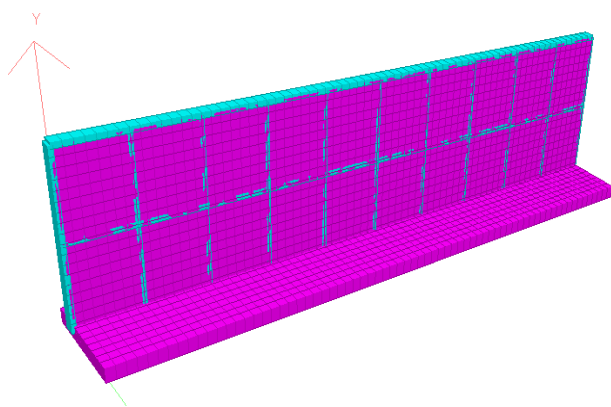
Column Beam Cantilever Retaining Wall (CBCRw)
